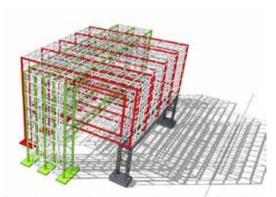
diagram of supporting steel frames used to fix cladding to and to make structure rigid.
